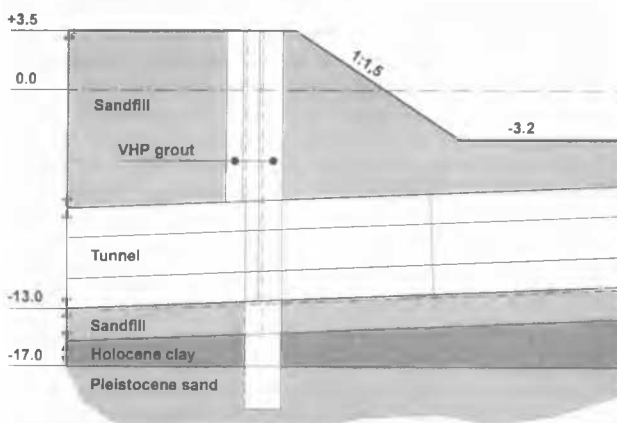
Cross-section of the jet grouted curtain and the northern side of the building pit.
